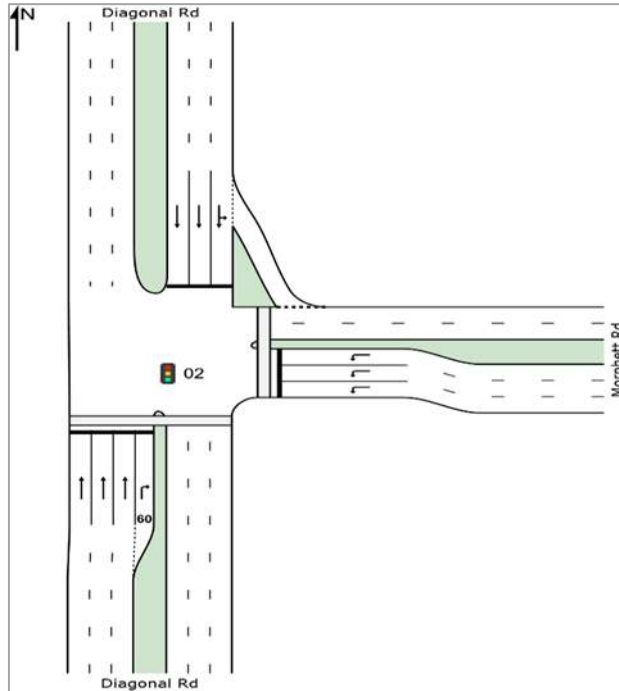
Cole's Intersection layout (Diagonal road and Morphett Road)
